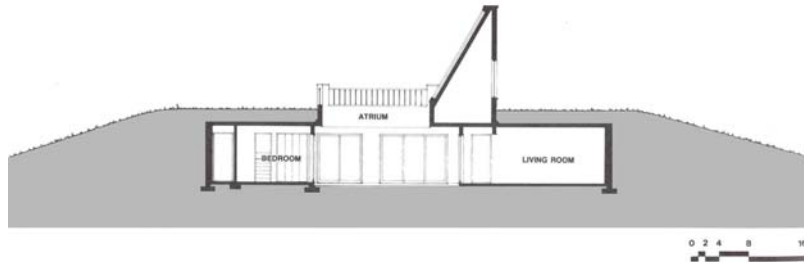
Clark House section showing the central courtyard and solar collectors.
